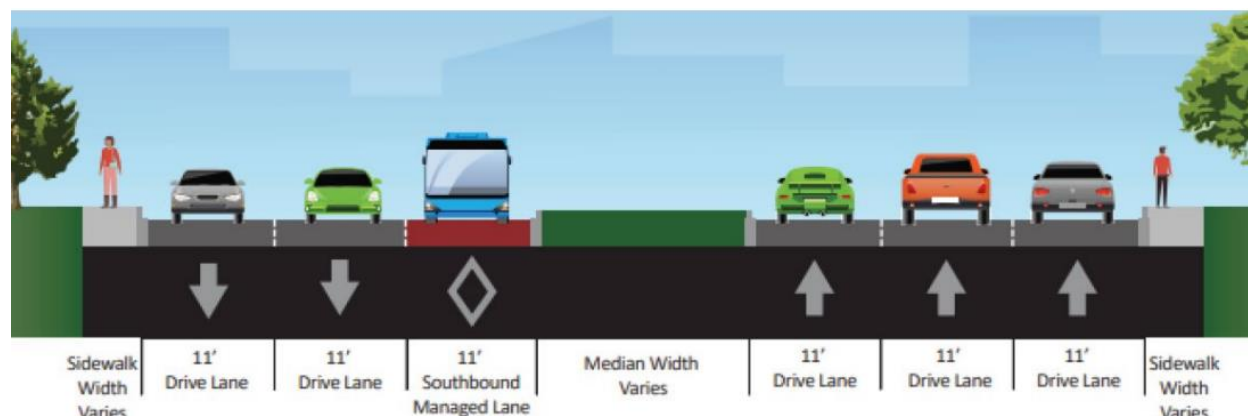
Managed Lane Alternative Cross Section, from New Hampshire Ave (MD 650) to Southwood Avenue (AM Peak Period).
